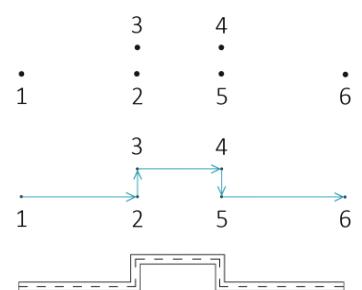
For A-BIM, the path that each wall takes is defined through a list of points that, when connected in pairs, represent the walls' axes.
